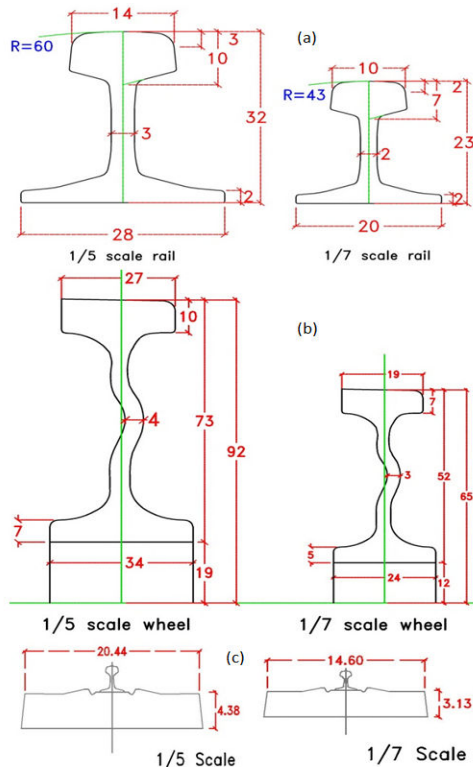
Geometry of components in 1/5 and 1/7 scaled test rigs, all dimensions are in mm, (a) rails, (b) wheels, (c) sleepers
